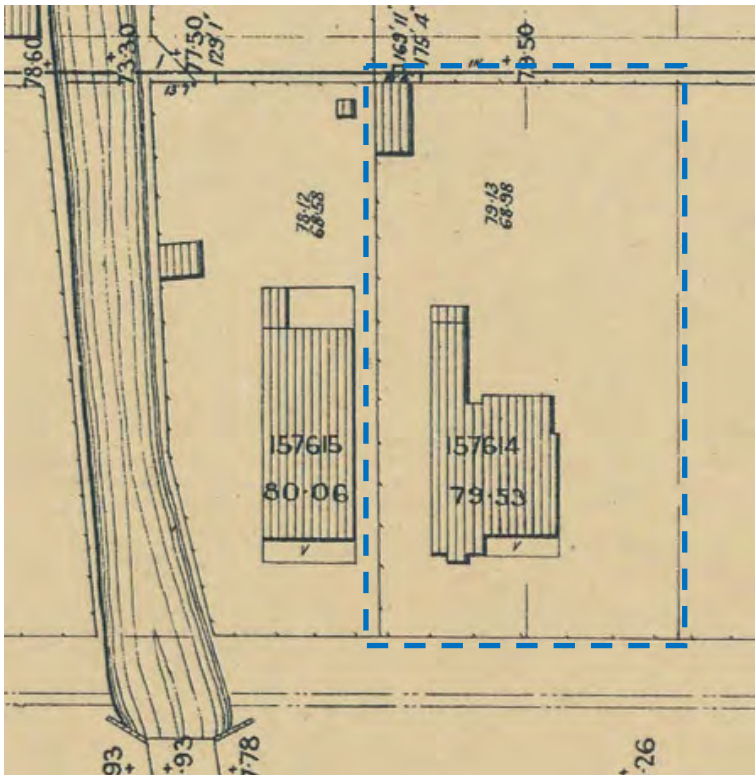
1926 plan of the subject site, showing a footprint of the house and small outbuilding on the rear boundary (Source: MMBW DP 2837, dated 1926).
